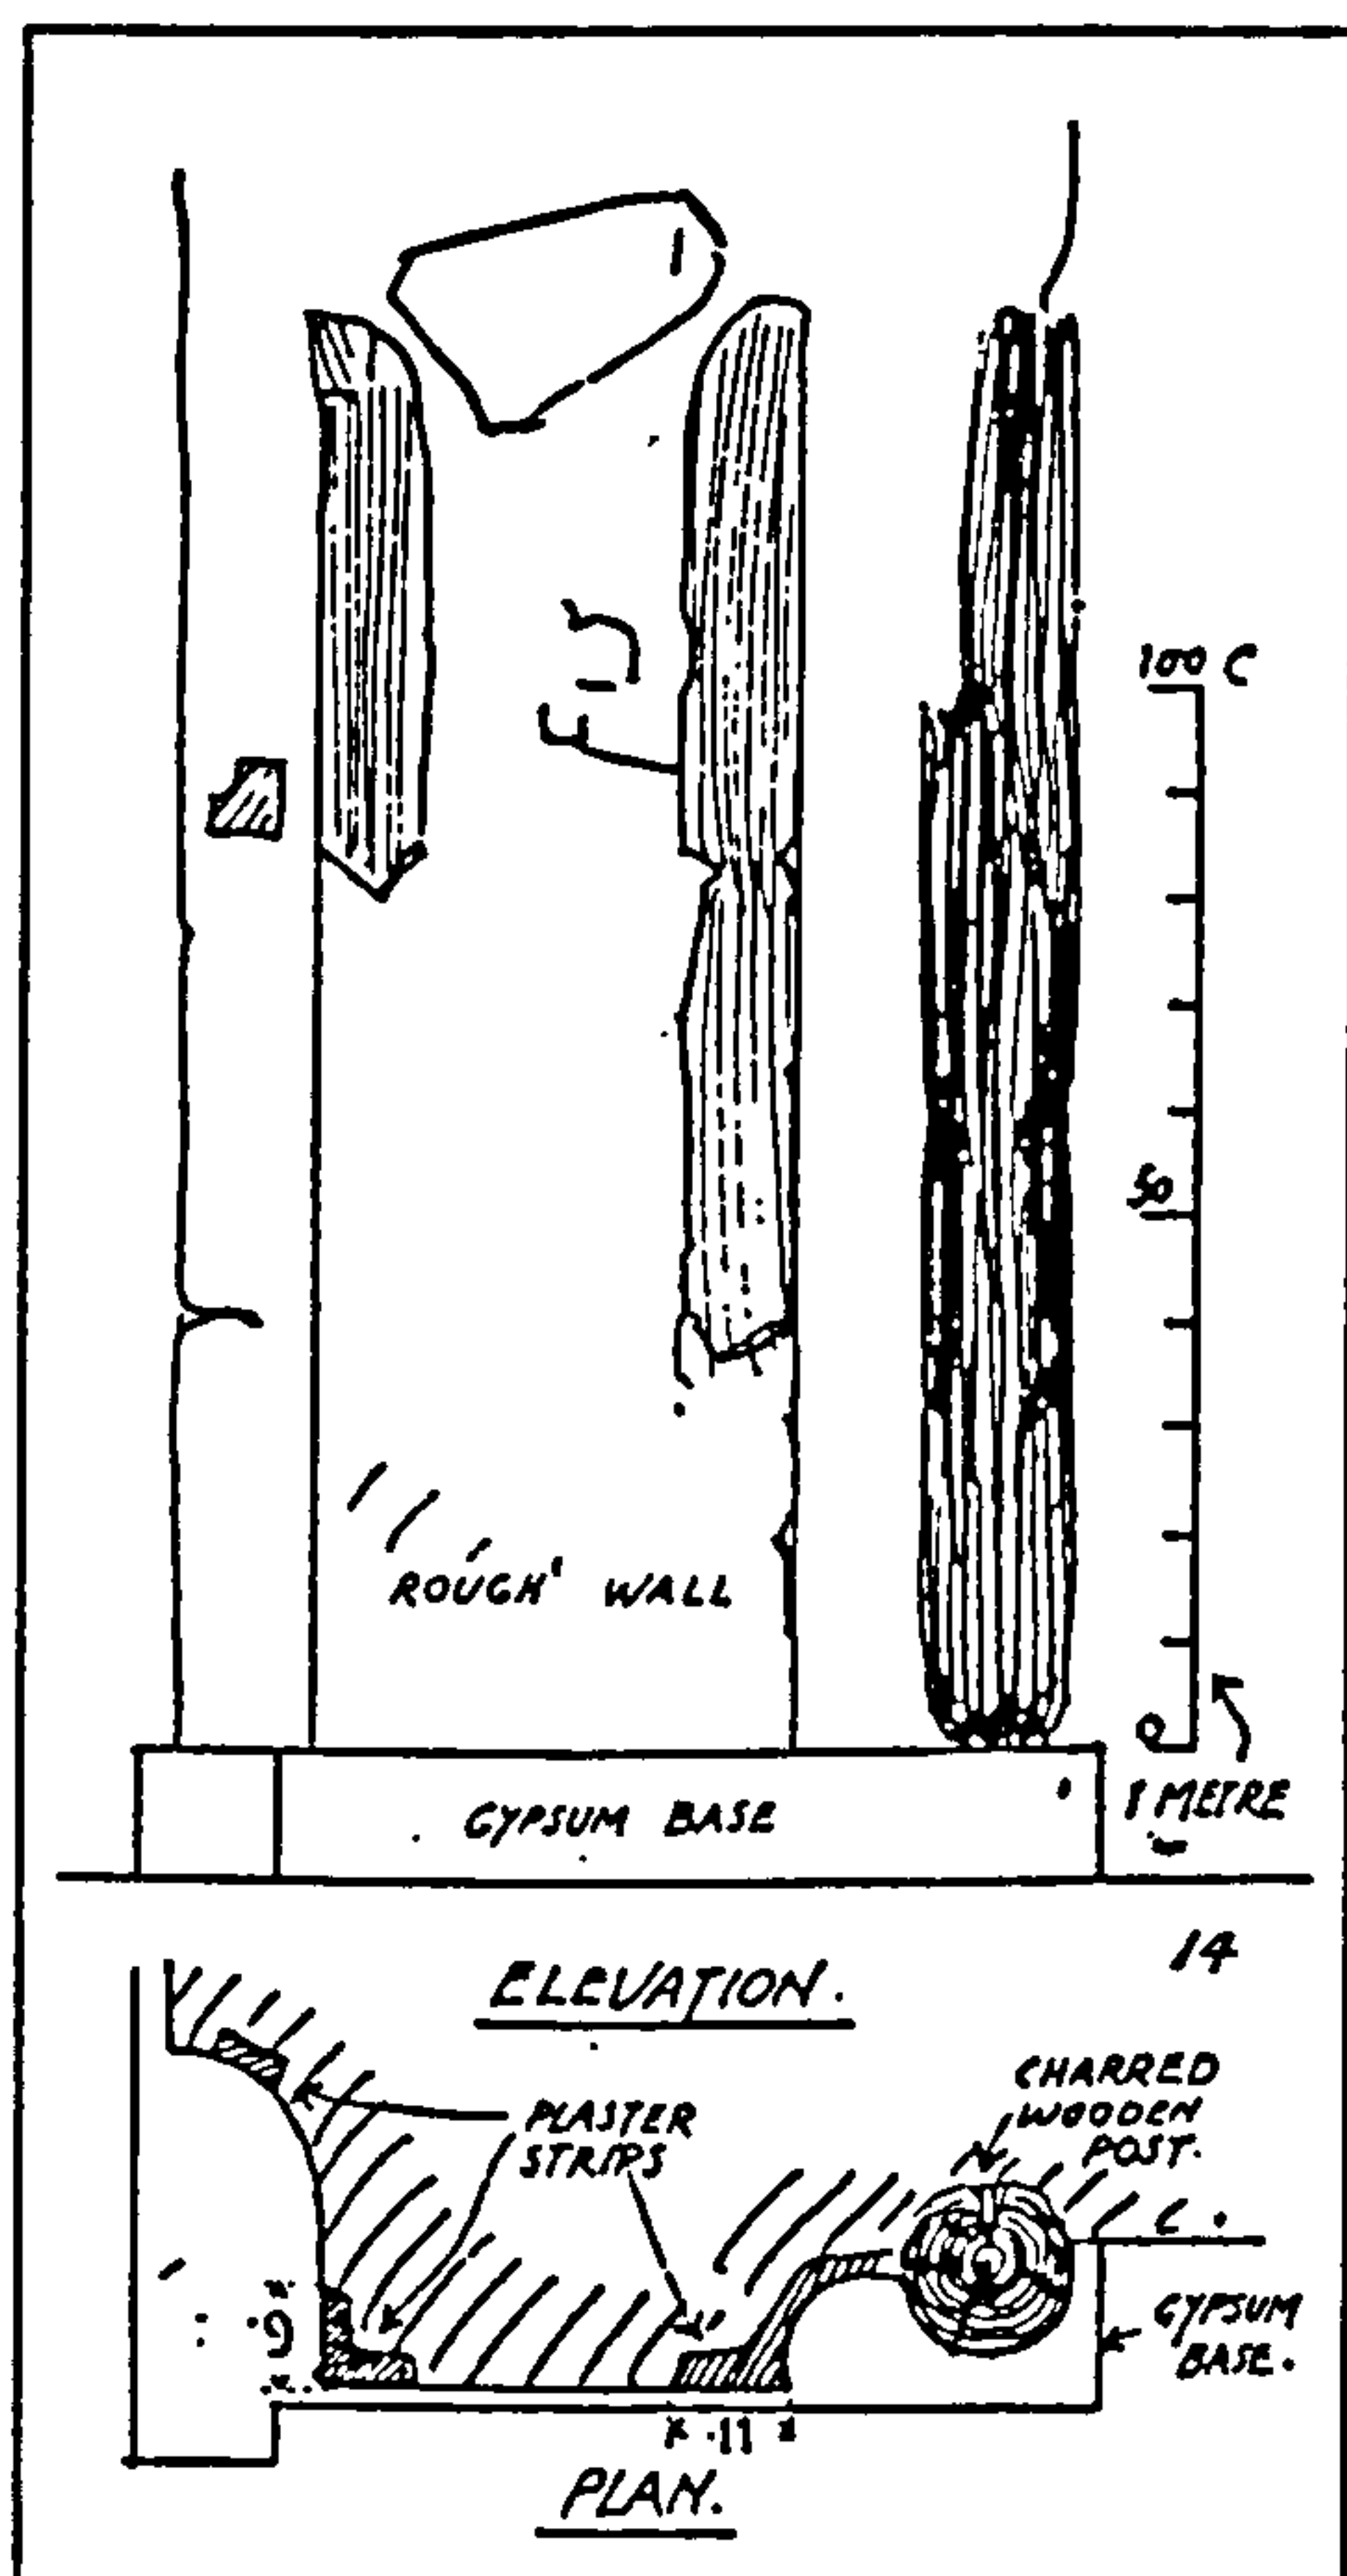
Plan and elevation of a door jamb. Drawing by Theodore Fyfe.
